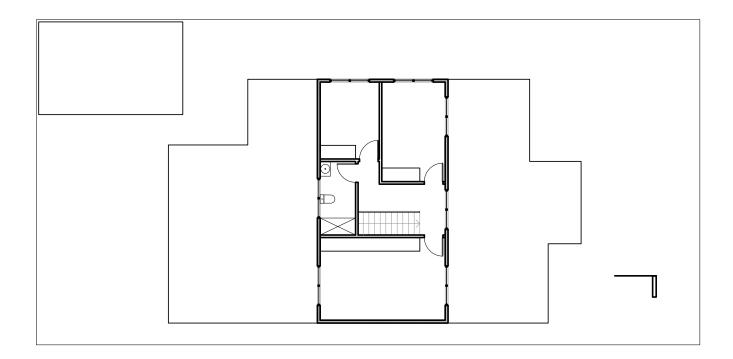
ROOMING HOUSE FIRST FLOOR PLAN
